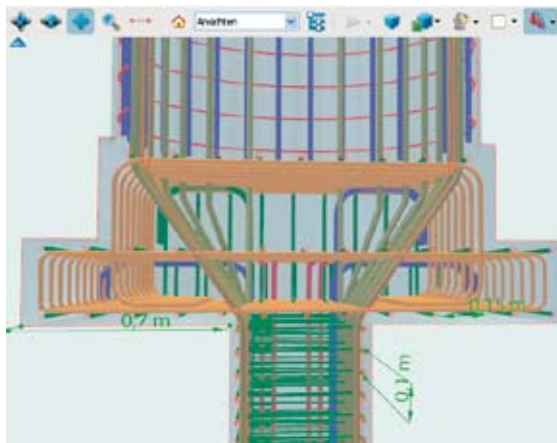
Highly reinforced column; routing of sections and measurement in 3D PDF.
